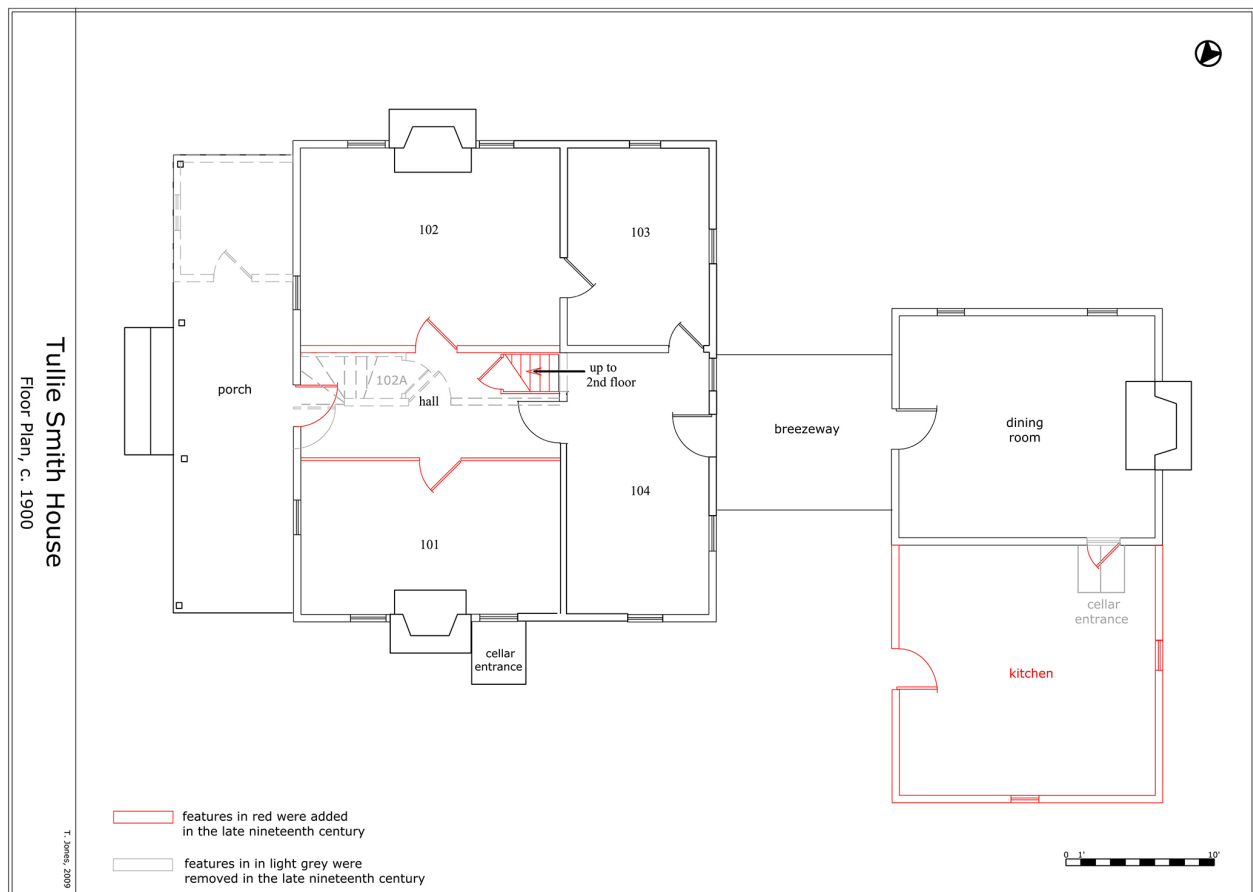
Floor plan as house probably existed in 1900. (Drawing by T. Jones)
